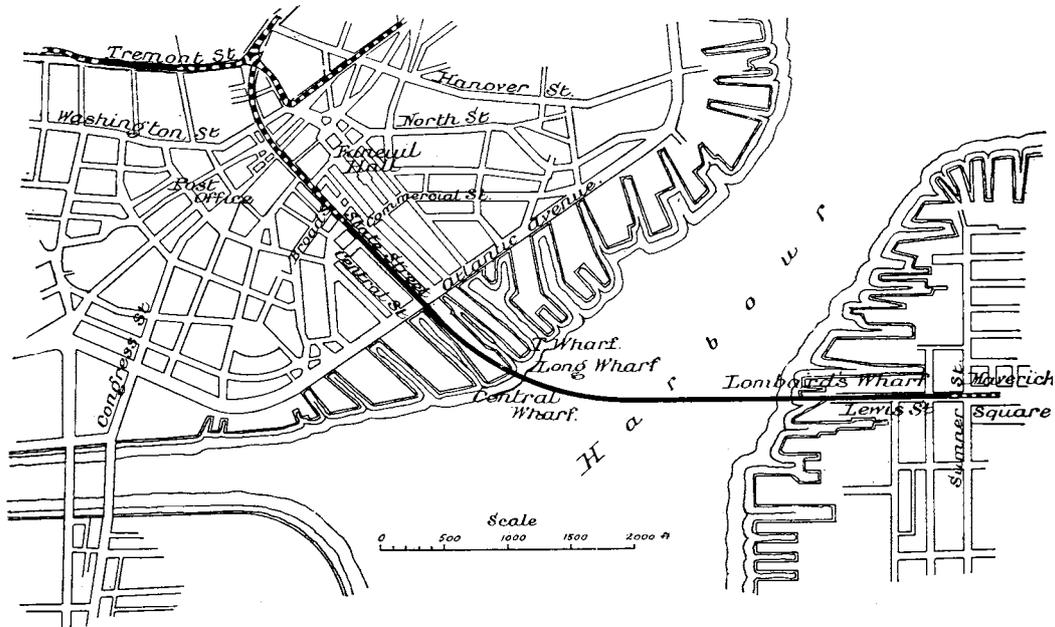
UNDERGROUND RAILWAY, BOSTON, U.S.A.
